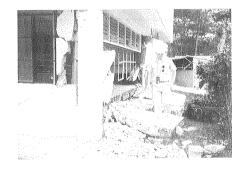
This non-structural wall of Quezon Hall at Teacher's Camp completely fell down .
